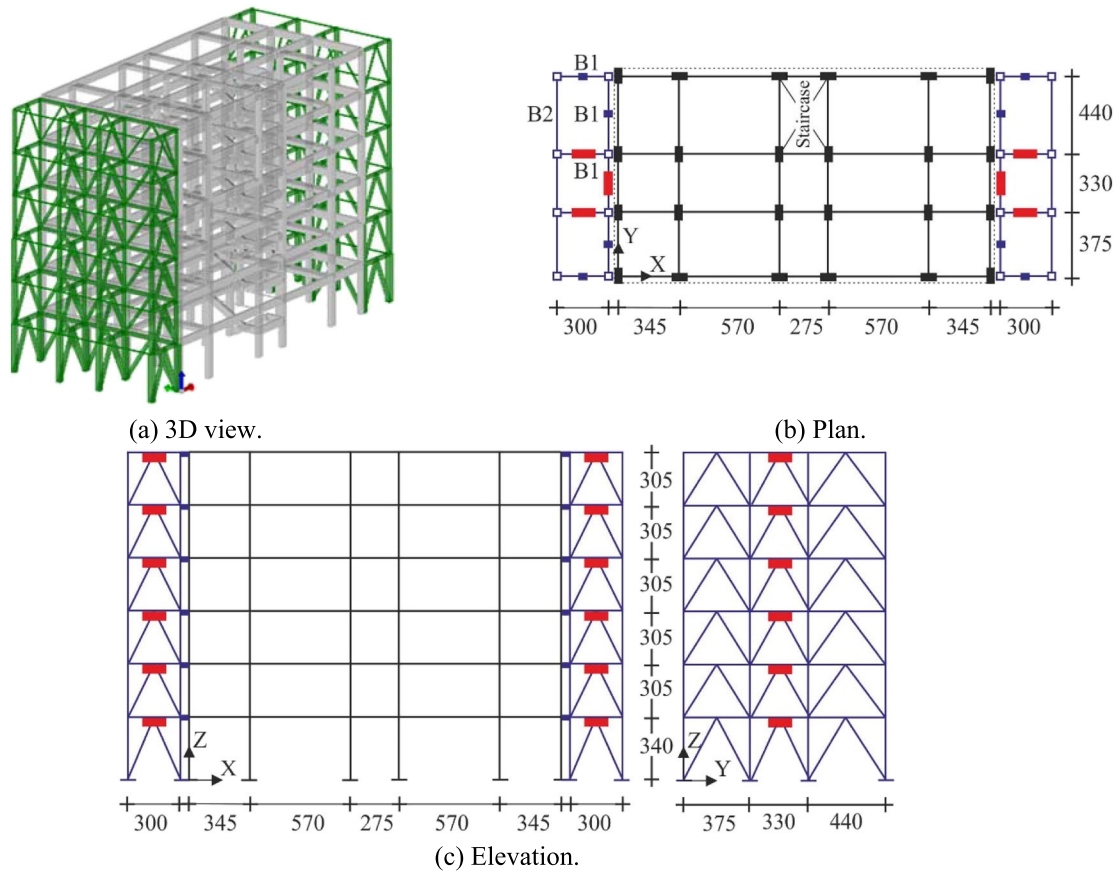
Dissipative exoskeleton with a mixed configuration (DEX.Mi) around the original building (unit in cm): chevron brace and viscous damped chevron brace
